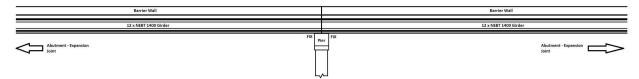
AutoCAD Drawing of elevation view of proposed replacement bridge
